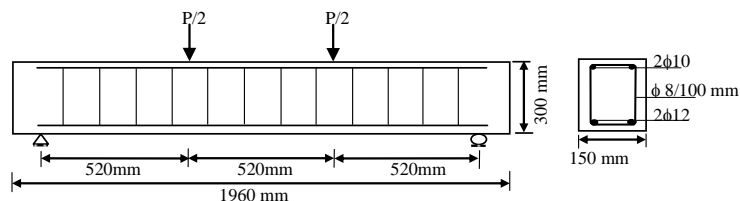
Geometry, arrangement of reinforcement and load of the tested beams.
